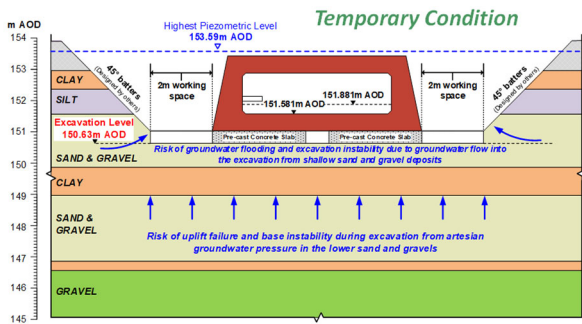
Conceptual model drawing depicting geology, groundwater level, culvert construction details, and groundwater hazards.
